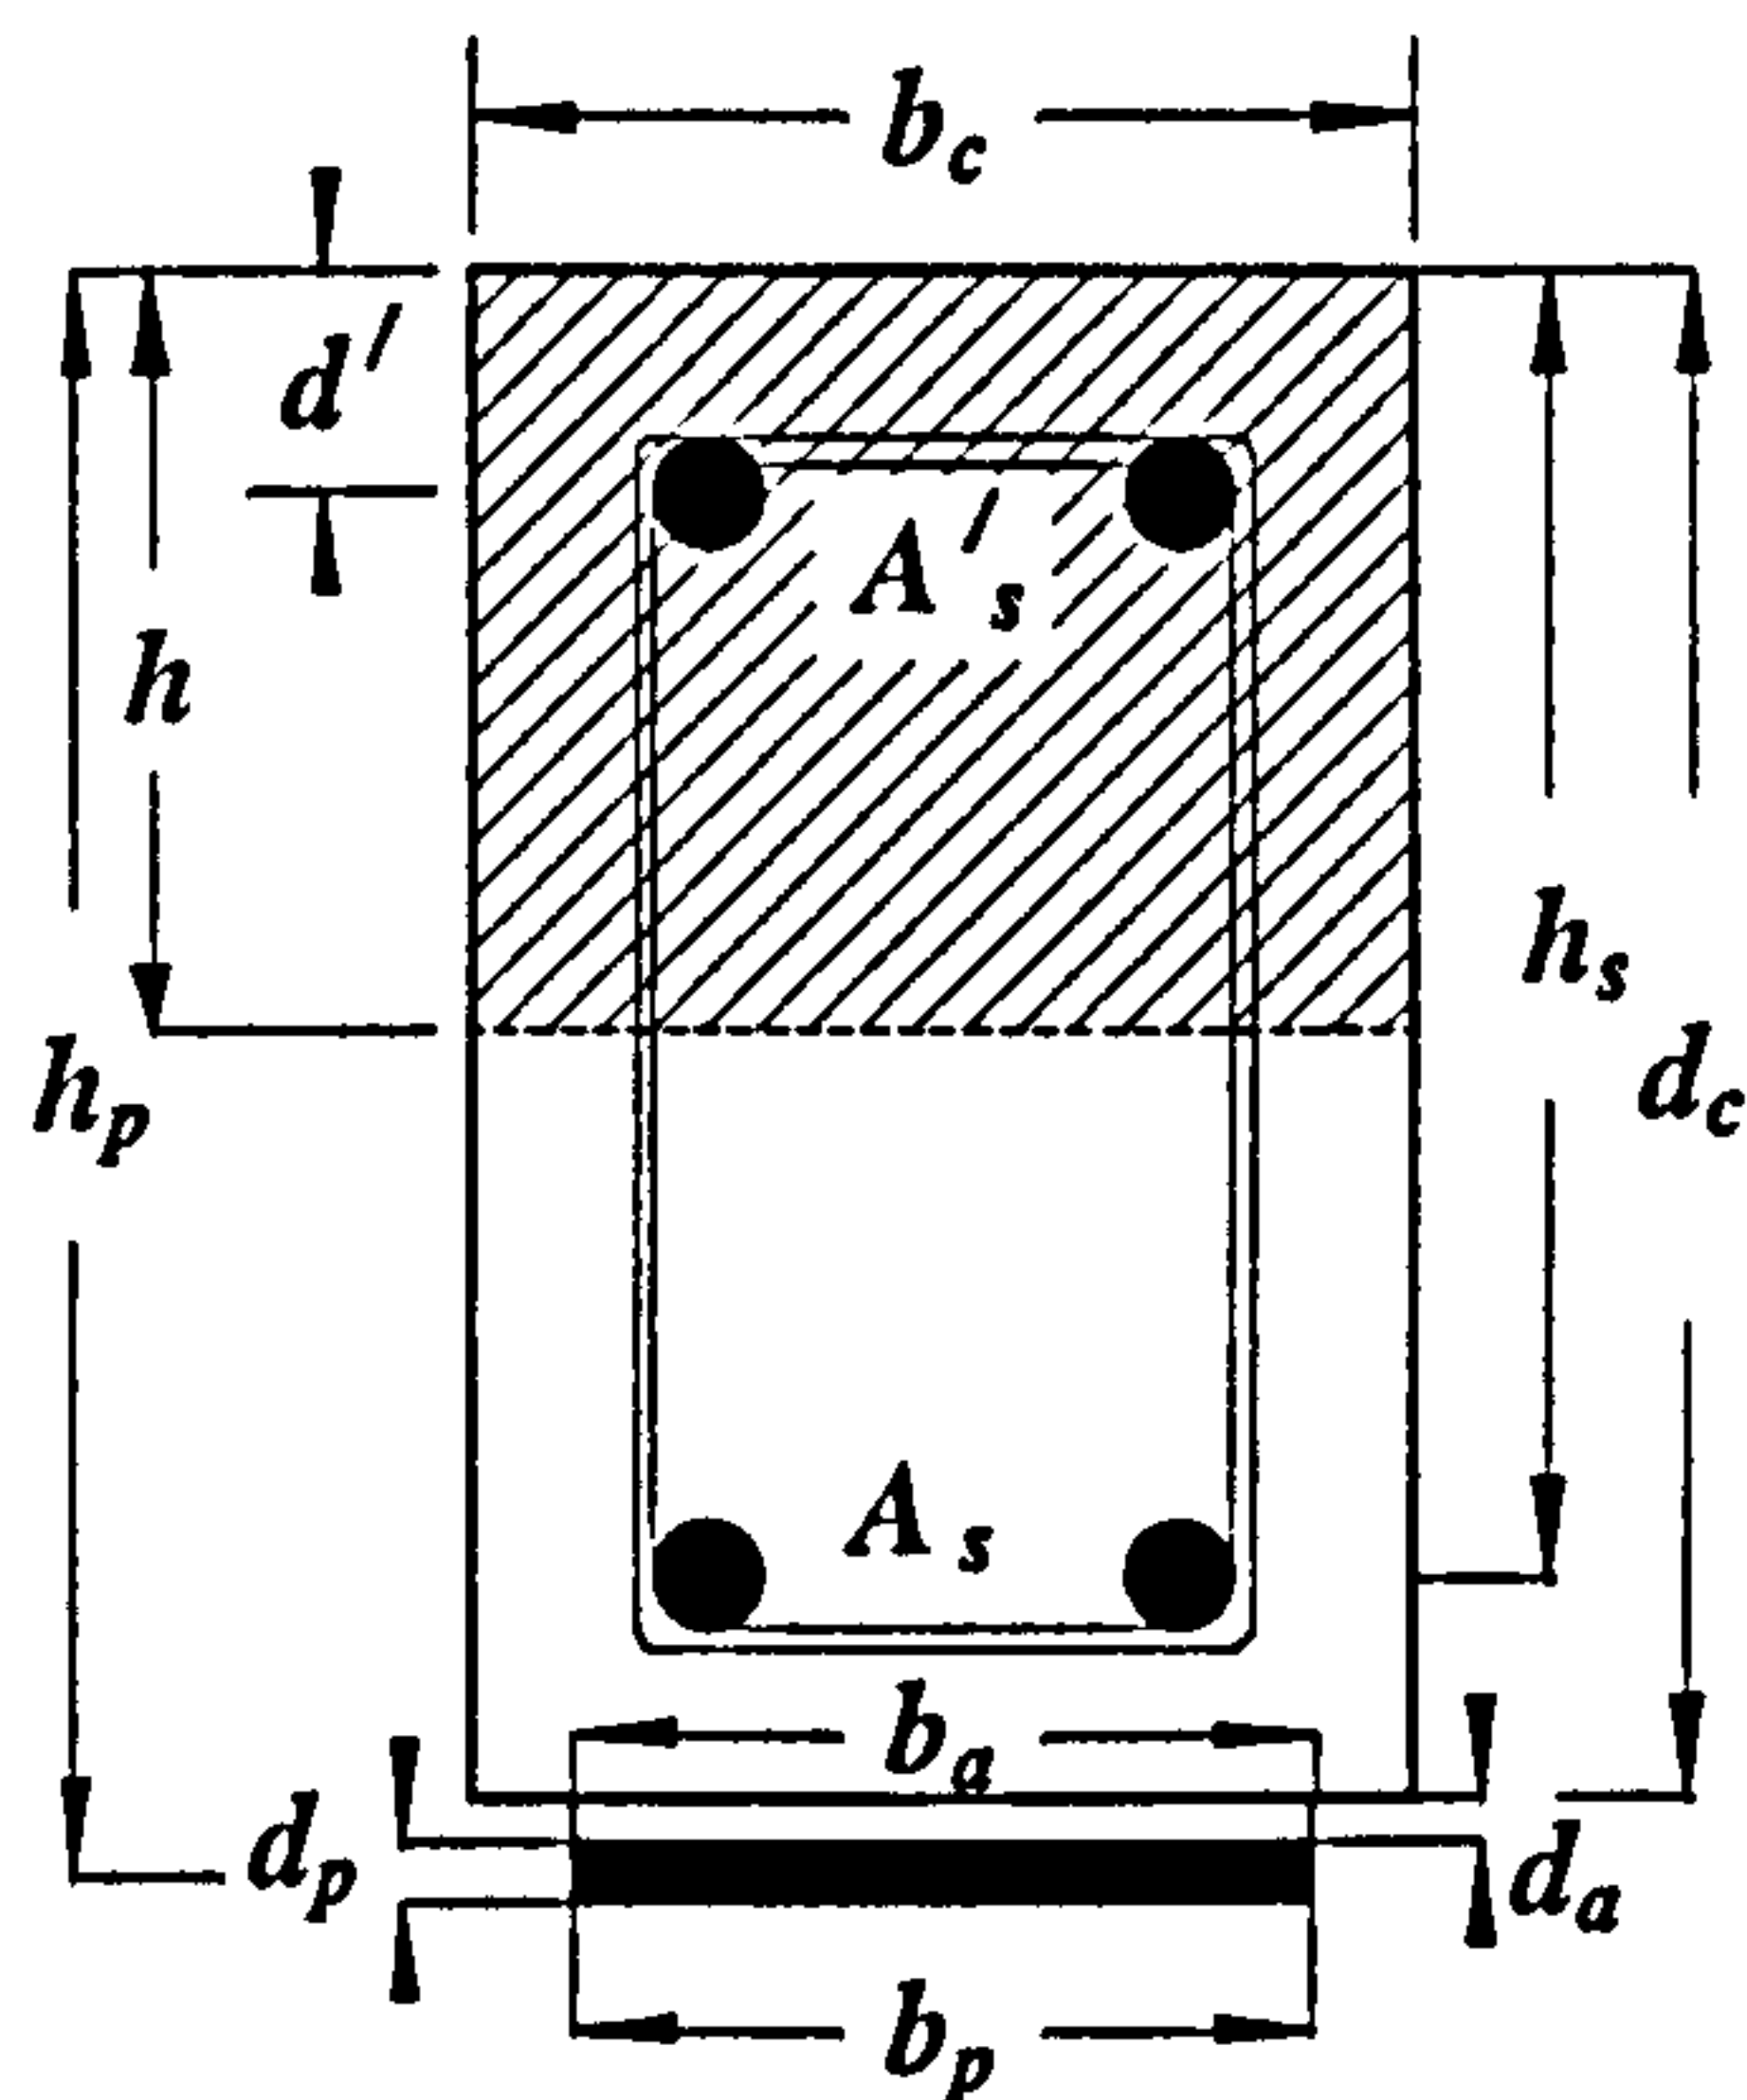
Typical cross-section of plated reinforced concrete beams .
